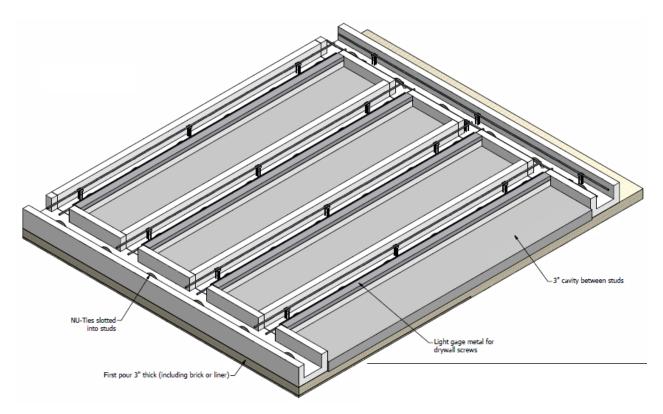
Proposed precast concrete panel for structures requiring drywall finish
